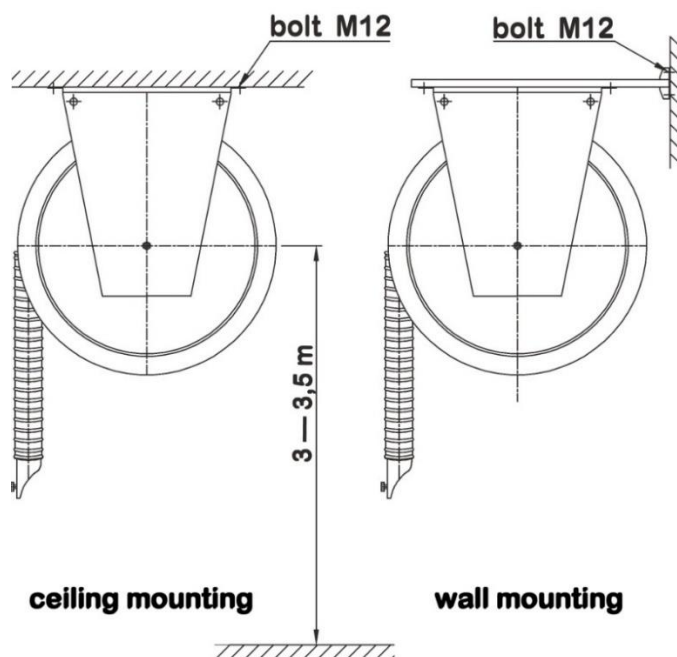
Mounting positions of the reel extractor at the operational place
